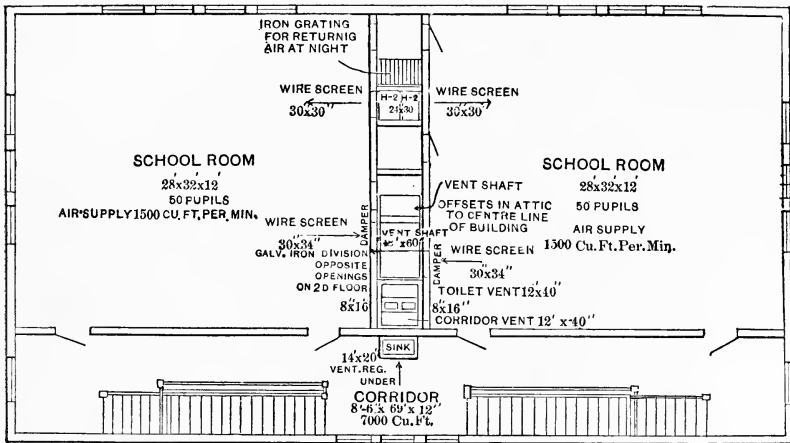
Second-Floor Plan (12' 0") of a School Building Heated by a Furnace System.
